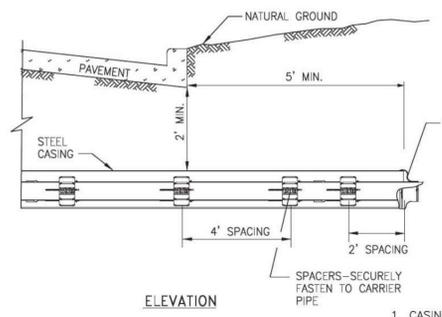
DETAIL OF WATER LINE CROSSING WASTEWATER FACILITIES WHERE SEPARATION IS LESS THAN 9' (NINE FEET)
